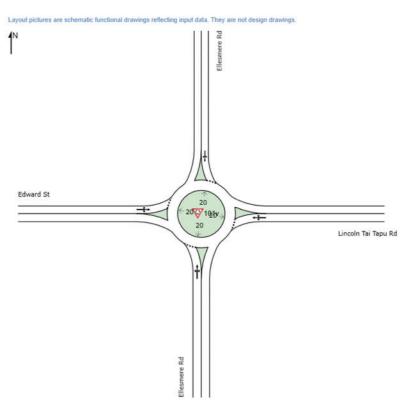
Edward St / Ellesmere Rd / Lincoln Tai Tapu Rd - Roundabout Concept
